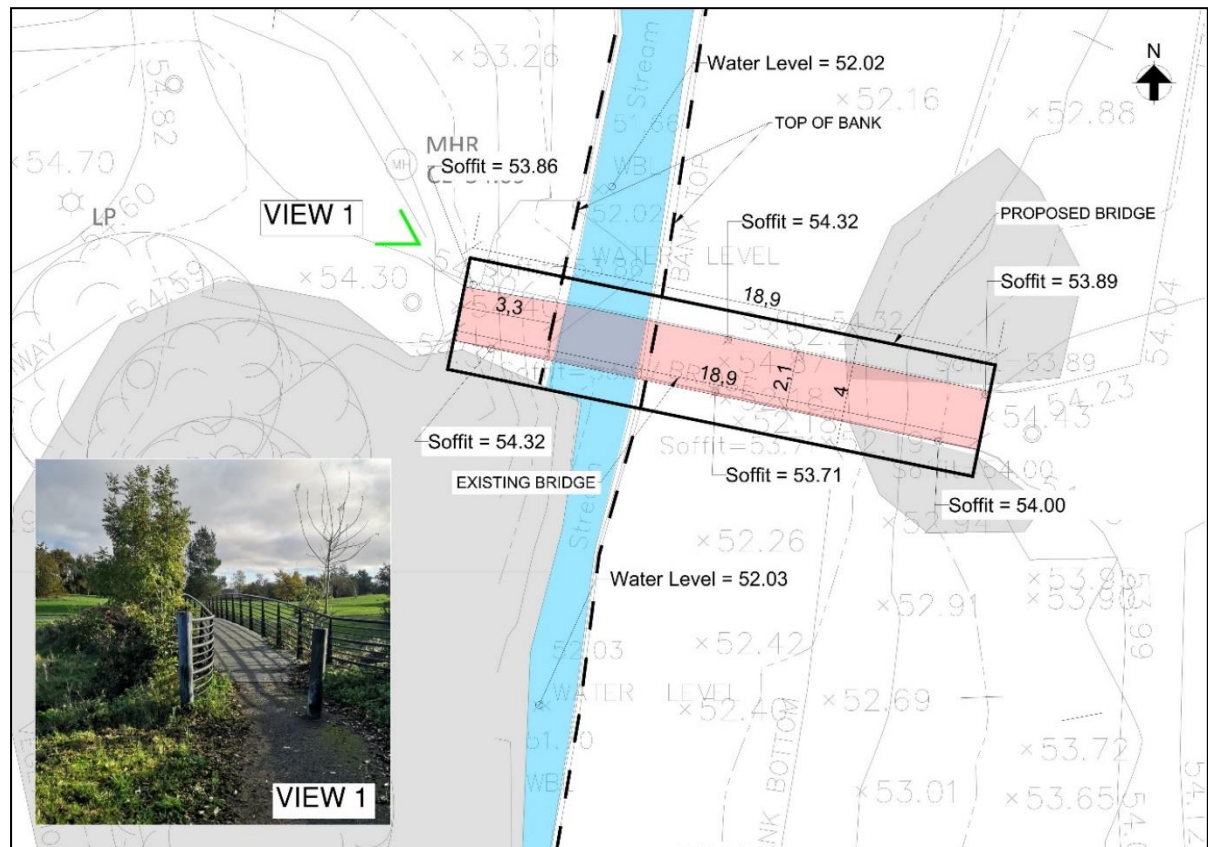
Plan View of Existing and Proposed River Griffeen Crossing No.1 (Source image: Arup)
